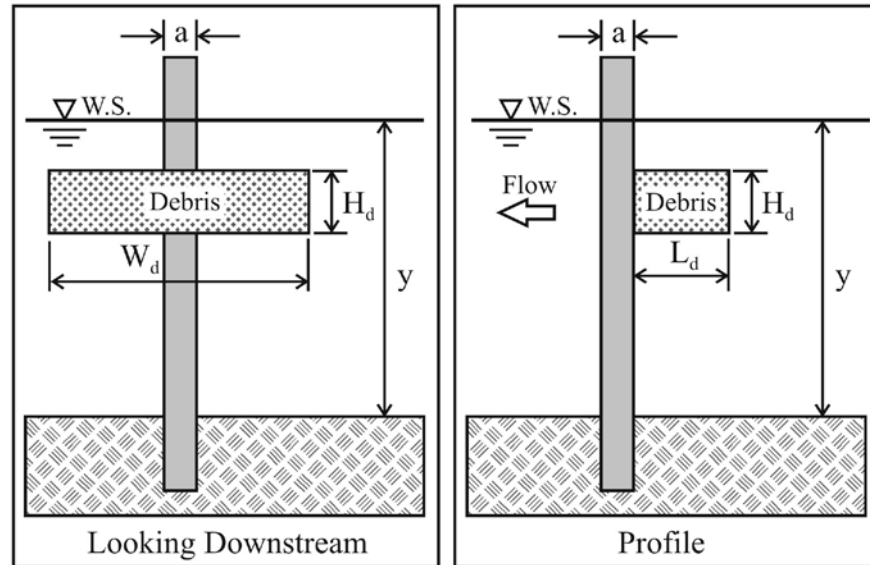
Rectangular accumulation of debris at a pier (Lagasse et al. 2010)
